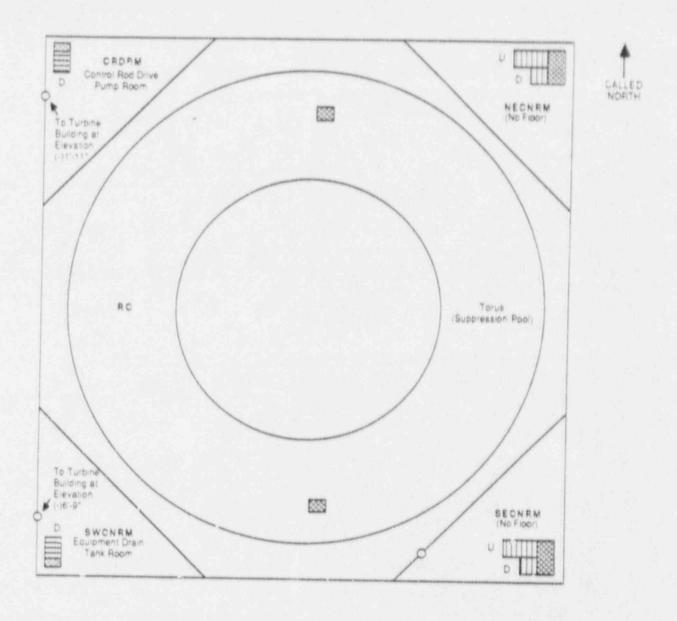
Oyster Creek Reactor Building - Elevation (-) 6'-5" and (-) 1'-11"
